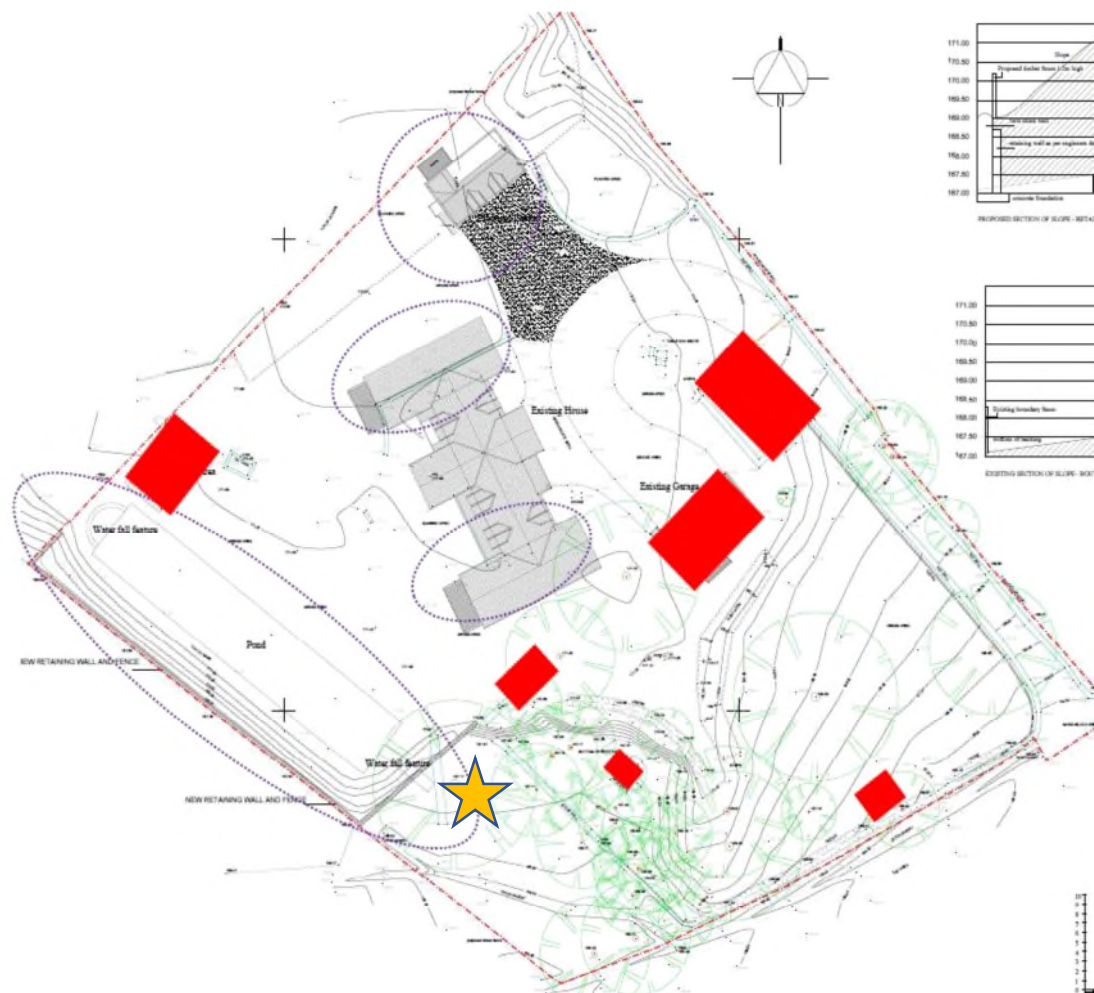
Location of existing outbuildings/structures within approved curtilage ■ and further approved works ○
